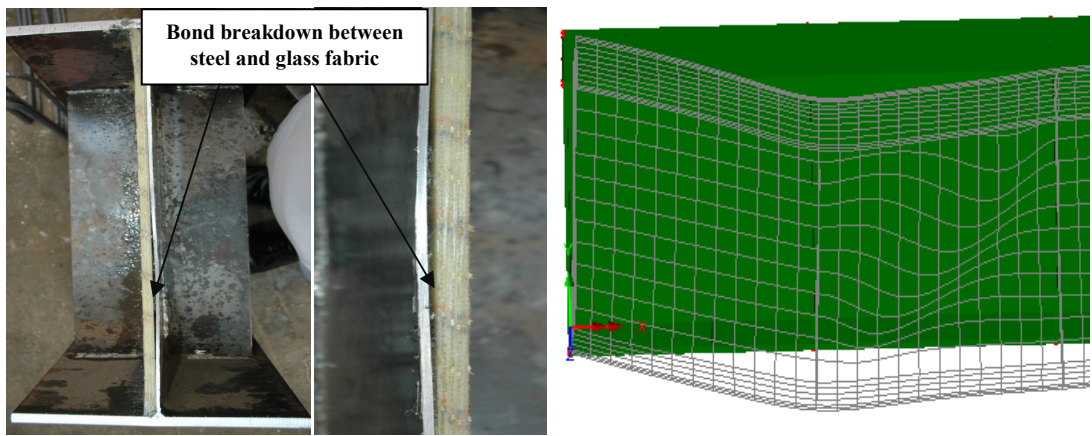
Test and FEA modes of failure of glass fabric-strengthened specimen B4
